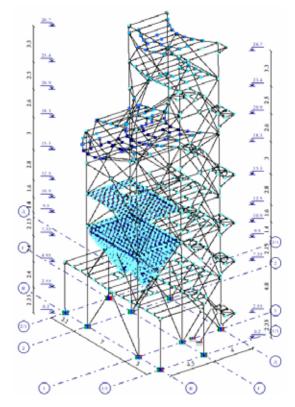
Natural vibration modes of the working tower structures using steel-concrete composite floor slabs with profiled metal decking as permanent formwork
